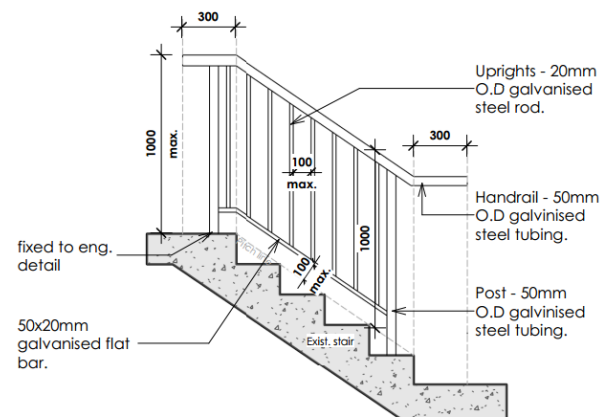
Staircase 7 (see site plan) – to receive safety handrails on both sides.
